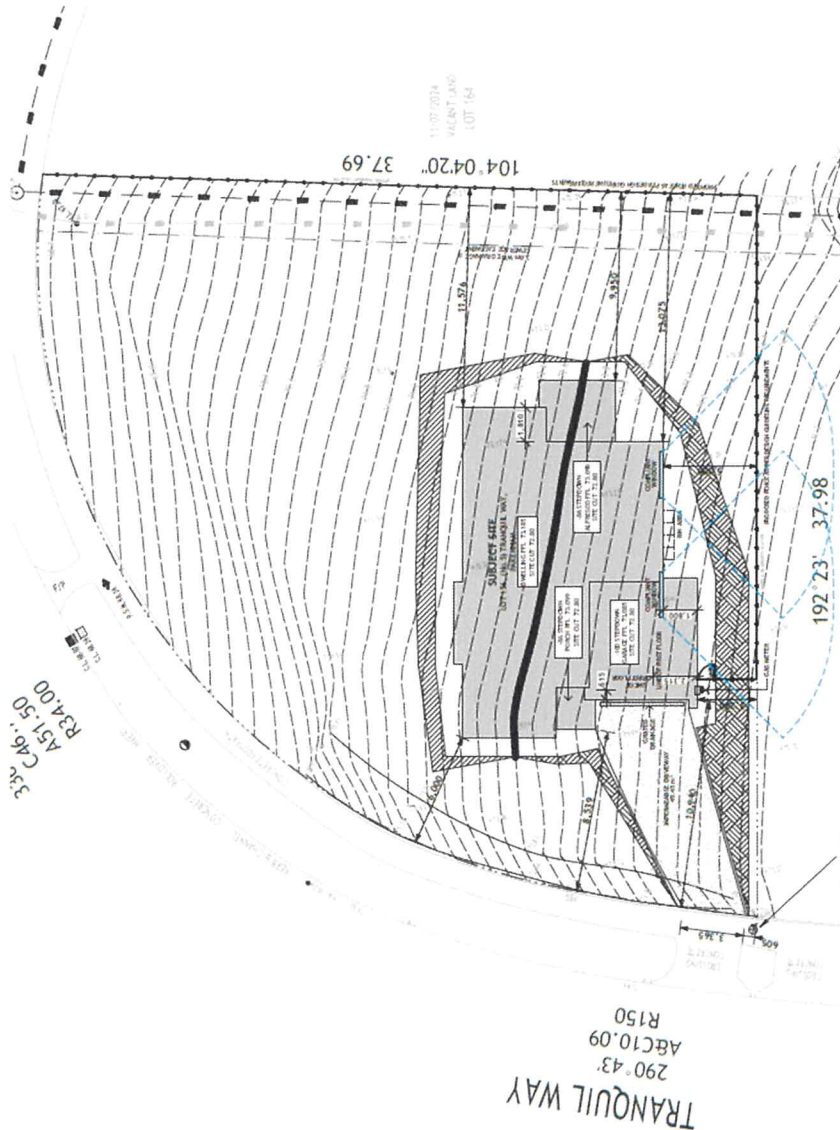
Site Plan (Source: Aliya Homes, Sheet No. 100-002, v.03)
